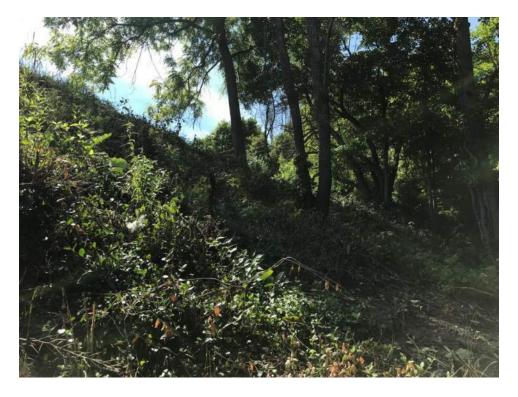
View of the left, downstream embankment just left of the spillway abutment wall.
